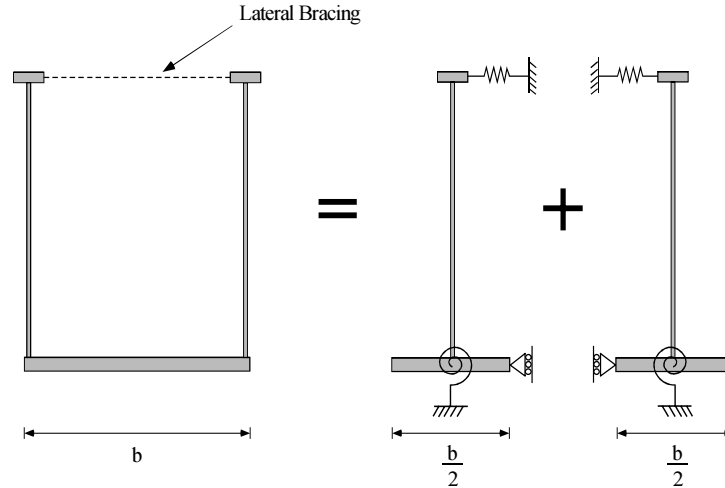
Half-Girder Model of a U-Girder with Top-Flange Lateral Bracing
